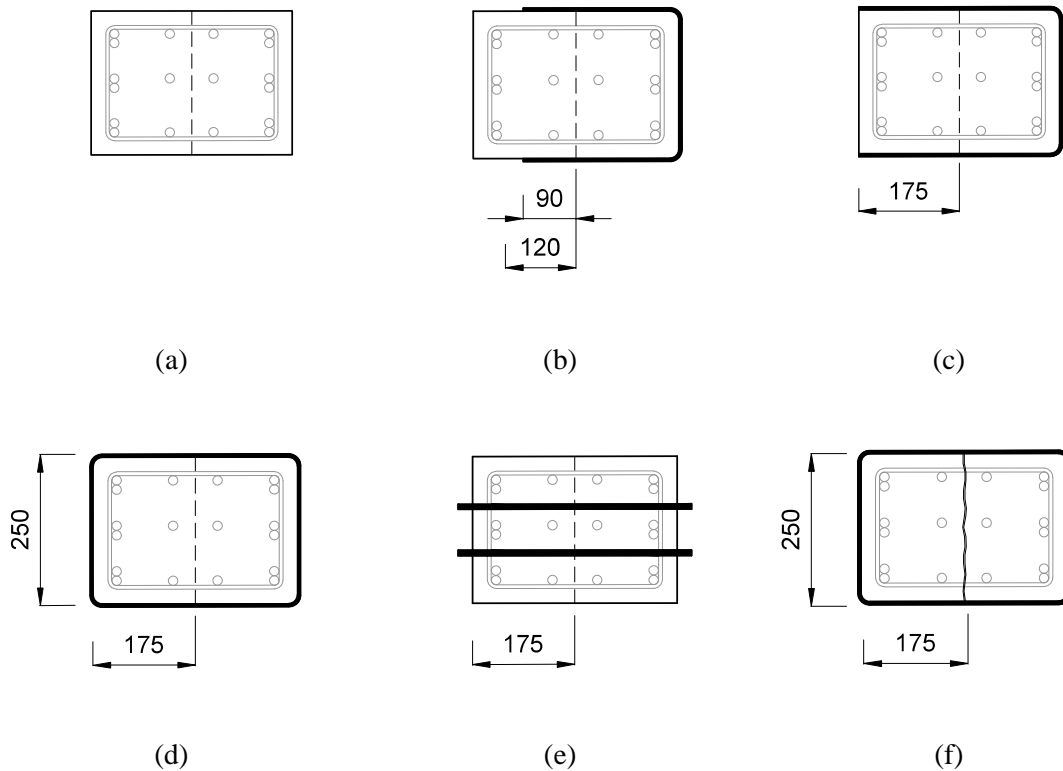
CFRP strengthening configurations: (a) unstrengthened control specimen, (b) short U-wrap, (c) long U-wrap, (d) full wrap with 250 mm overlaps at sides, (e) deep embedment and (f) pre-cracked fully wrapped specimen with 250 mm overlaps at sides [mm].
